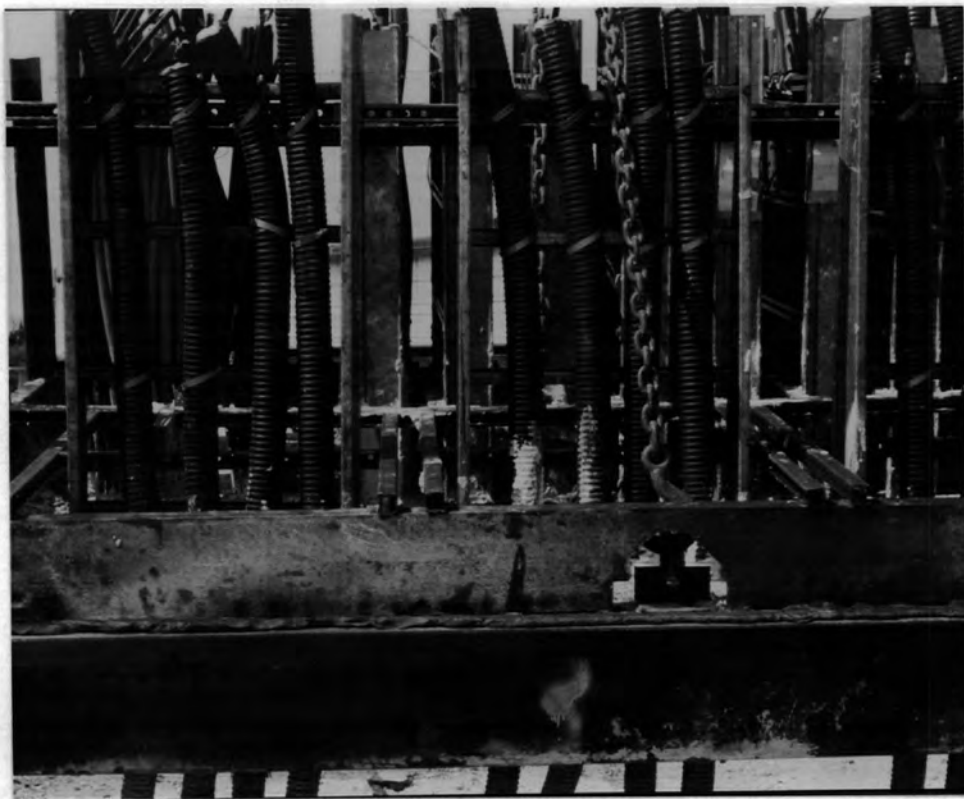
VIEW OF CABLE TRAYS PLACEMENT INTO TEST SLAB
